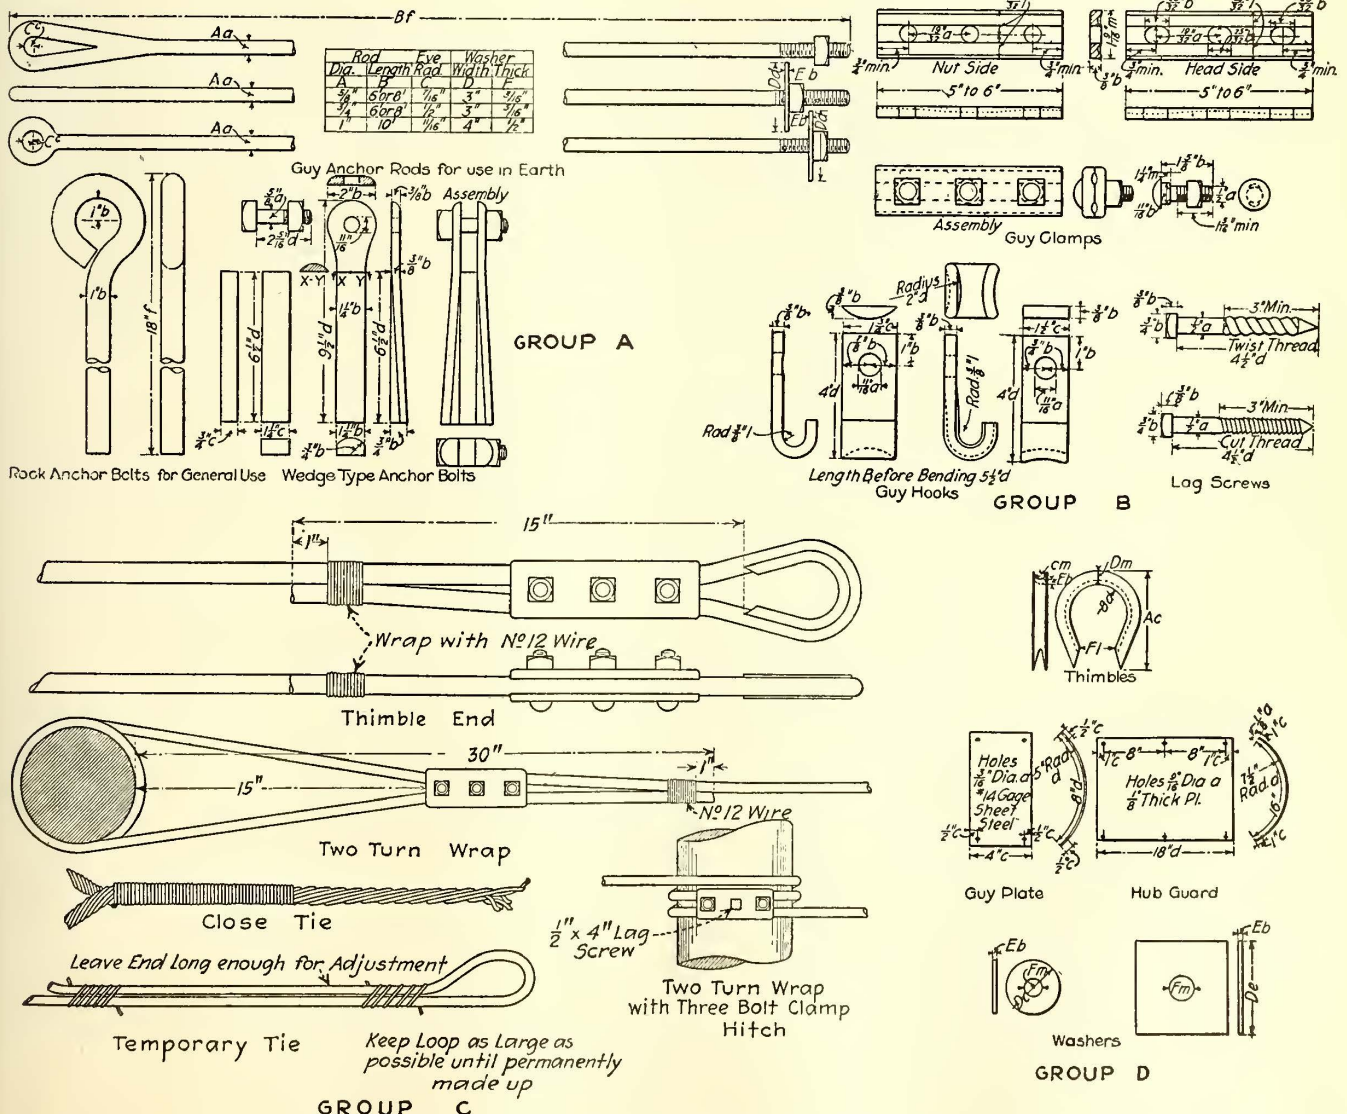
FURTHER DETAILS OF GUY CONSTRUCTION (FROM ENGINEERING MANUAL)
